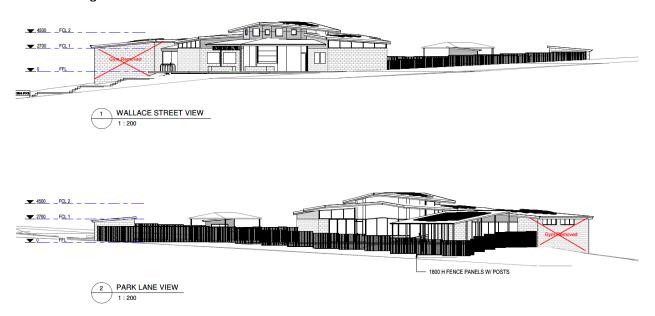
and 2: External Street Elevations (Prepared by Paul Barnett Design Group)
